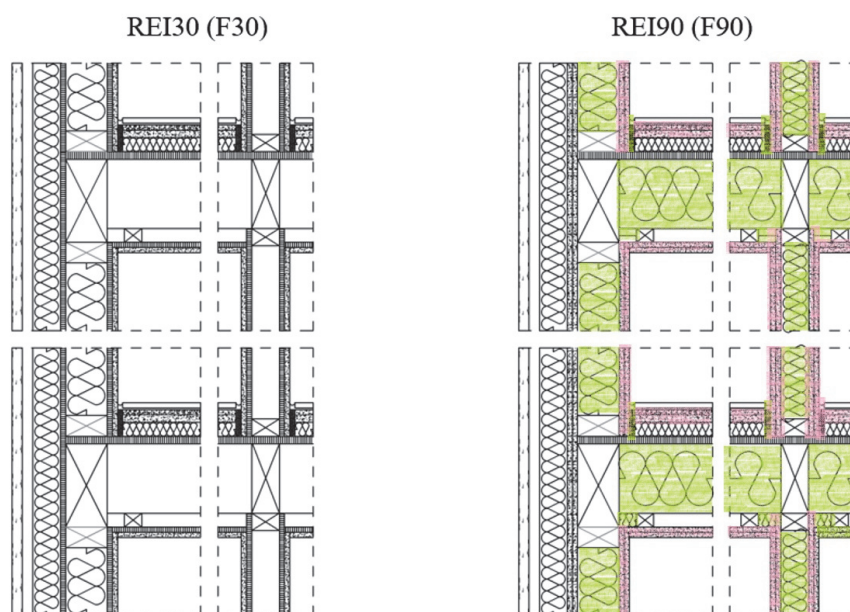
Connection of the external wall to the floor/ceiling slab. Comparison of timber construction details in F30 and F90 fire resistance standards according to the MHolzBauRL
